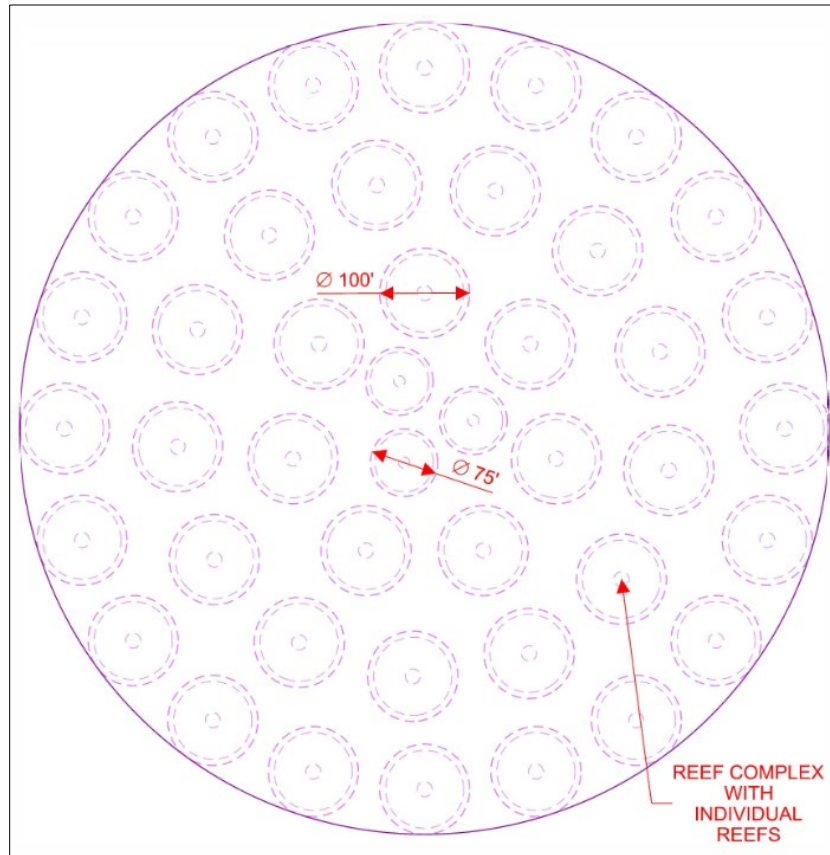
Plan View of Open Water Rocky Reef Complex
